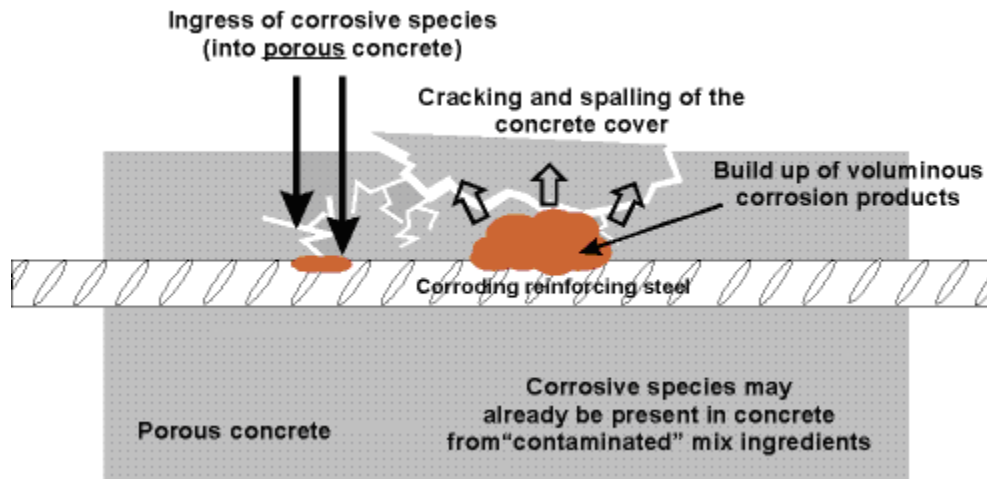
The mechanism by which steel reinforcement corrosion weakens reinforced concrete structures
